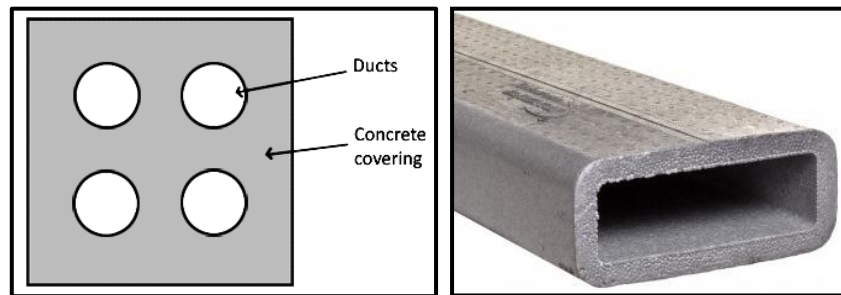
(b) Multi-channel concrete duct and rectangular concrete duct
